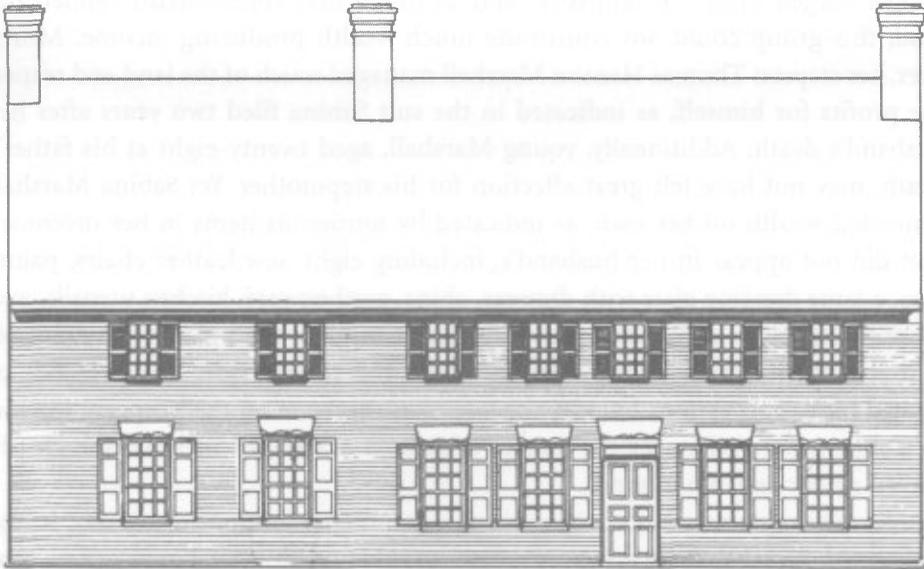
West elevation, Mistake House, c. 1770. (Long, "Historic Structure," 120.)
